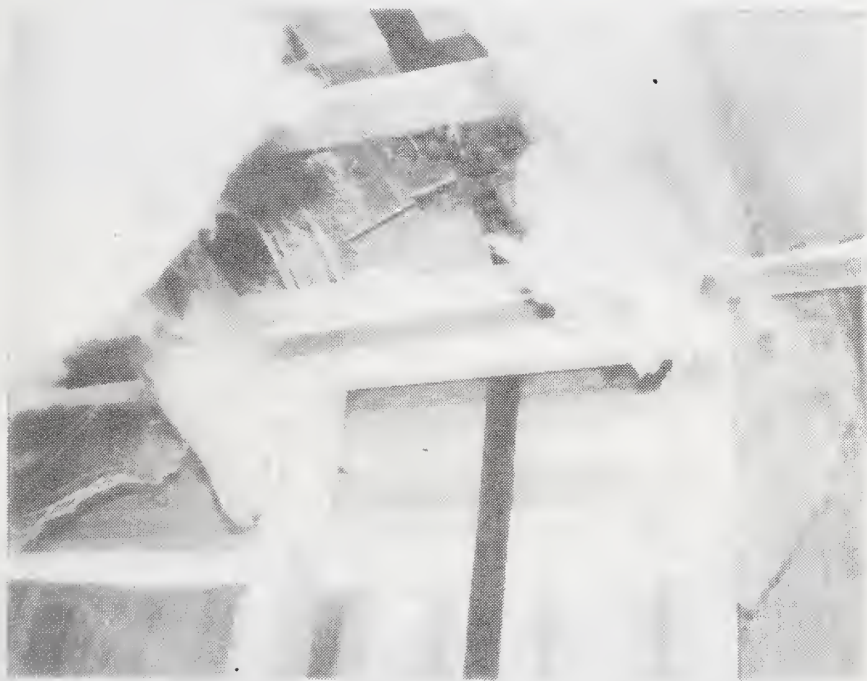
Under-the-Skin Tie Down Strap Located Between Roof Trusses (Better Design Would Locate Tie Down Straps at Roof Trusses to Insure Load Transfer Between Walls).
